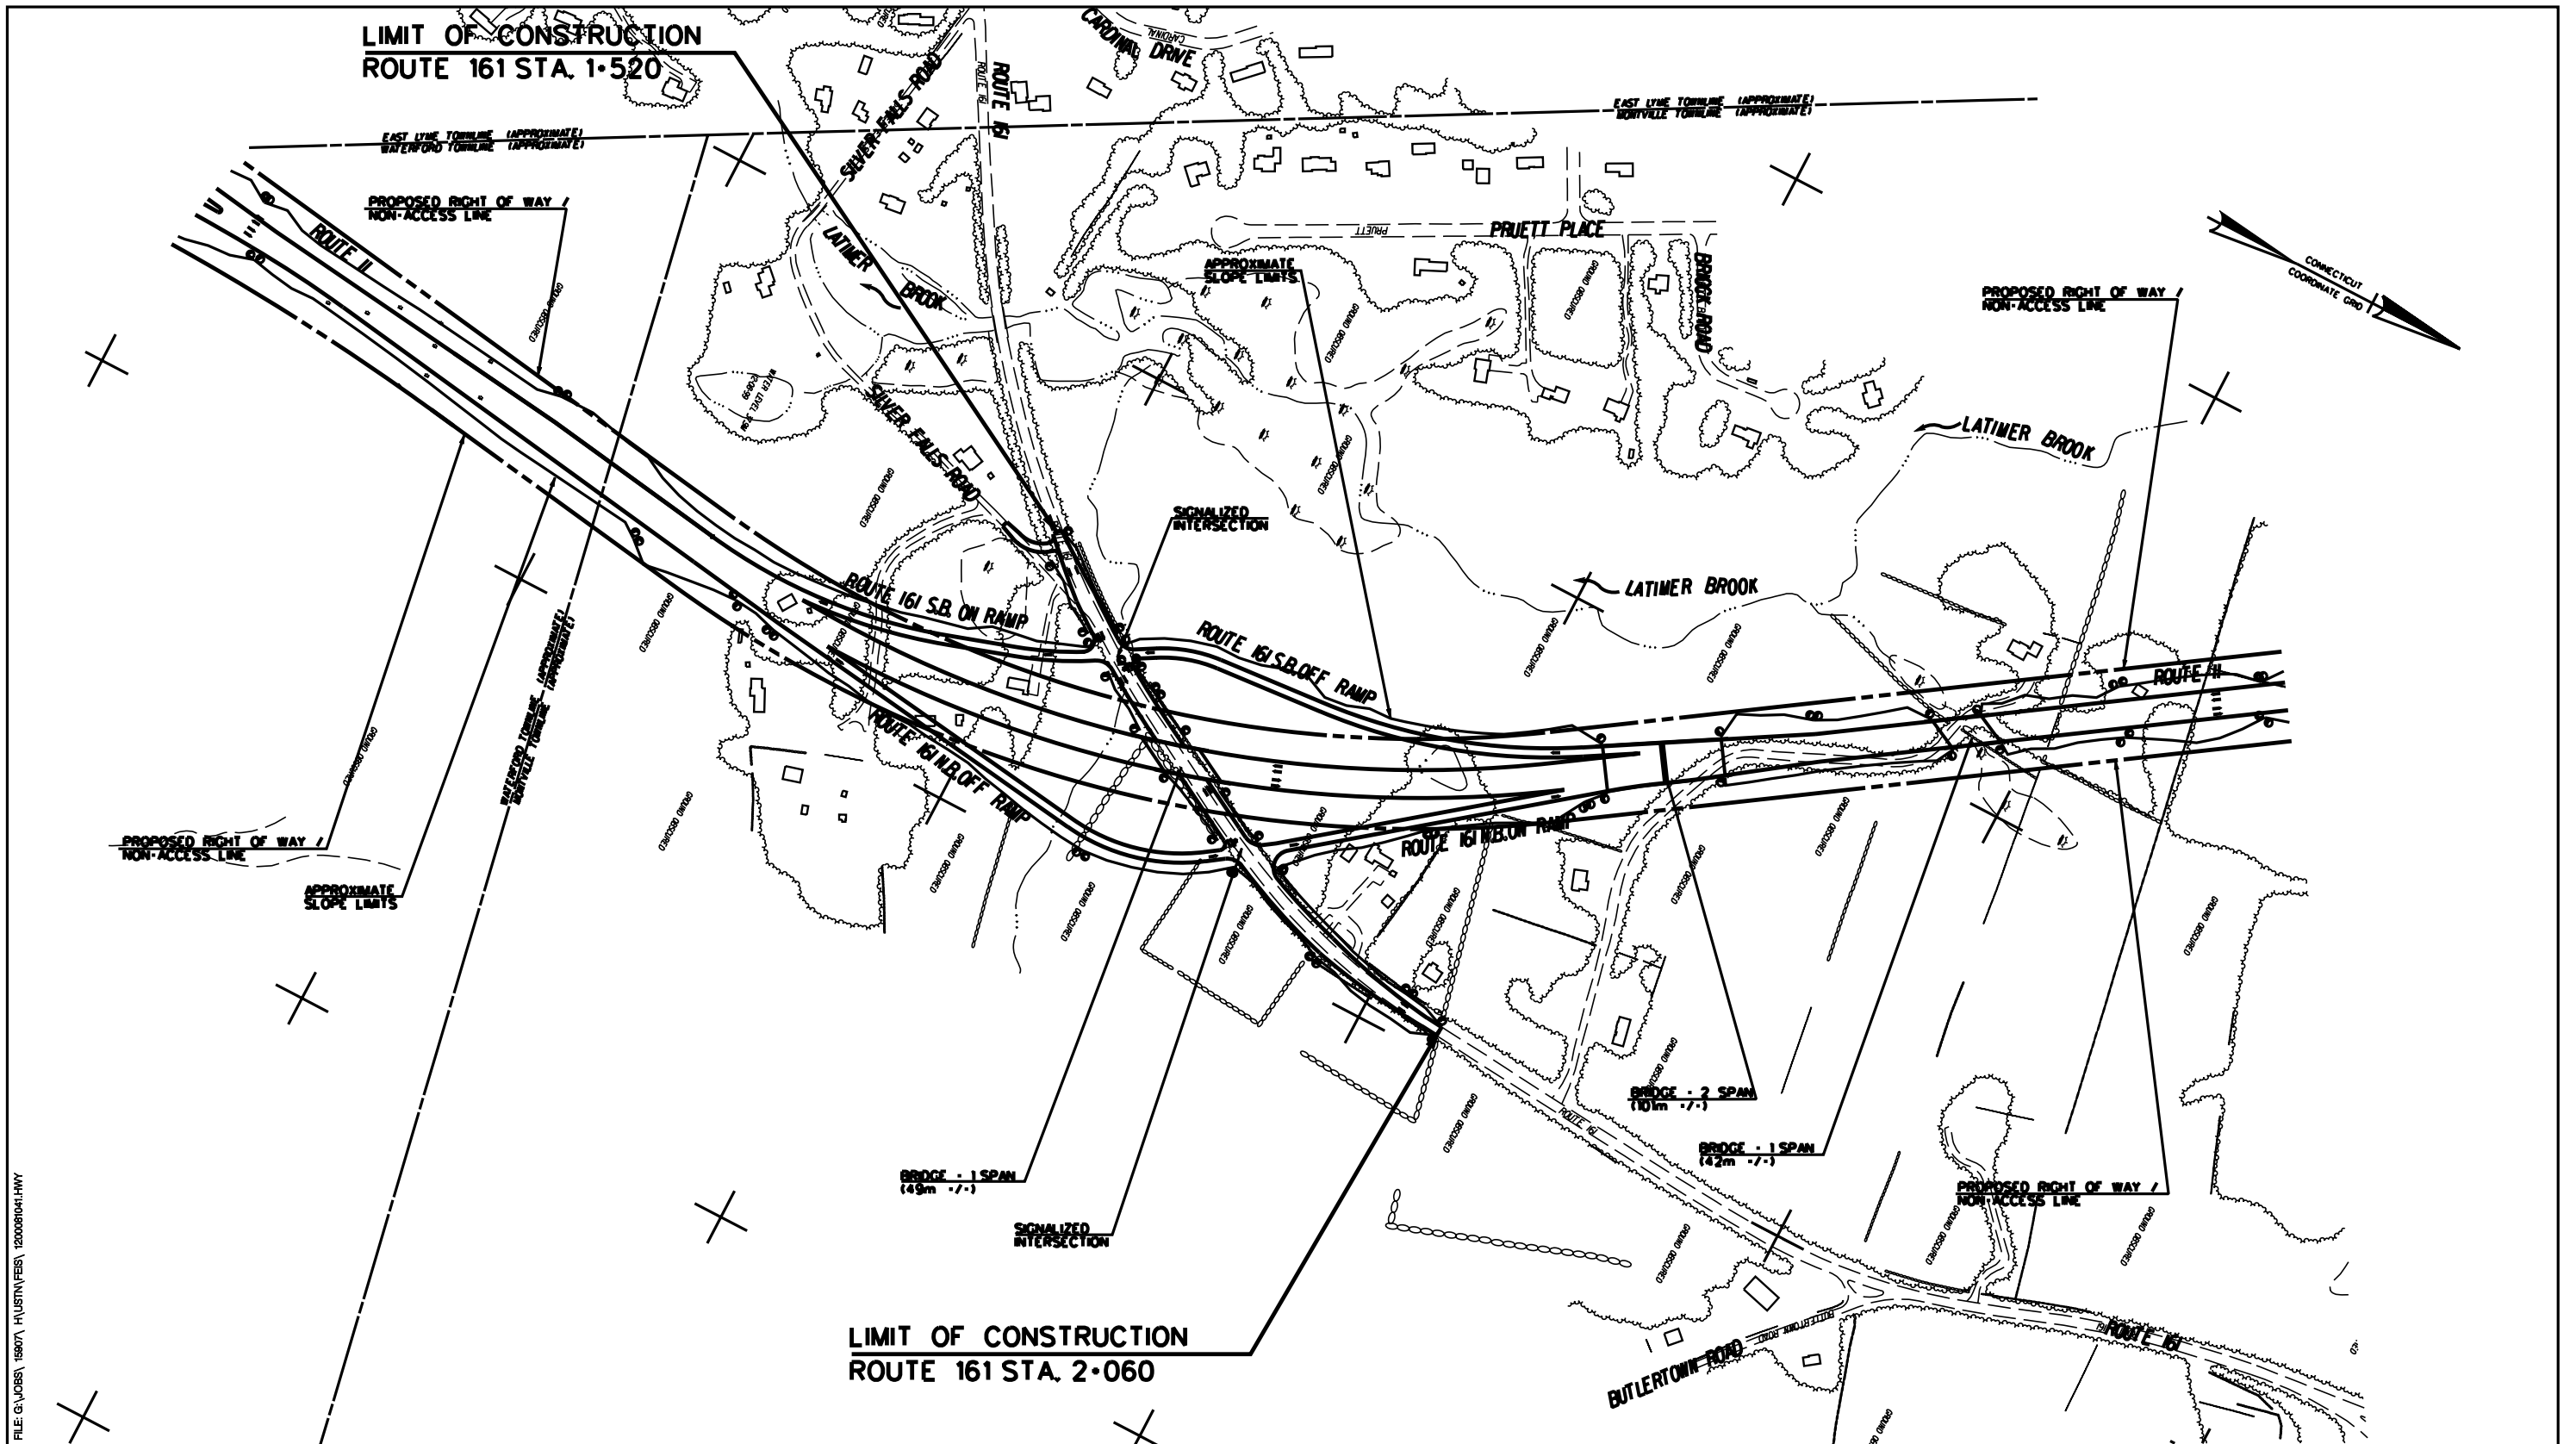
The alignment would cross over Route 161 approximately 1,160 m. (3,800 ft.) south of the intersection of Route 85 and Route 161, and approximately 140 m. (460 ft.) northeast of the intersection of Silver Falls Road and Route 161. Route 161 would require reconstruction for a distance of 540 m. (1,780 ft.) to provide adequate lane arrangements approaching and through the intersections for each of the on- and off-ramps associated with the interchange. Approximately 60 m. (200 ft.) along Silver Falls Road would have to be realigned to provide a suitable intersection with Route 161 and to provide adequate separation distance from the on- and off-ramps at the interchange.
